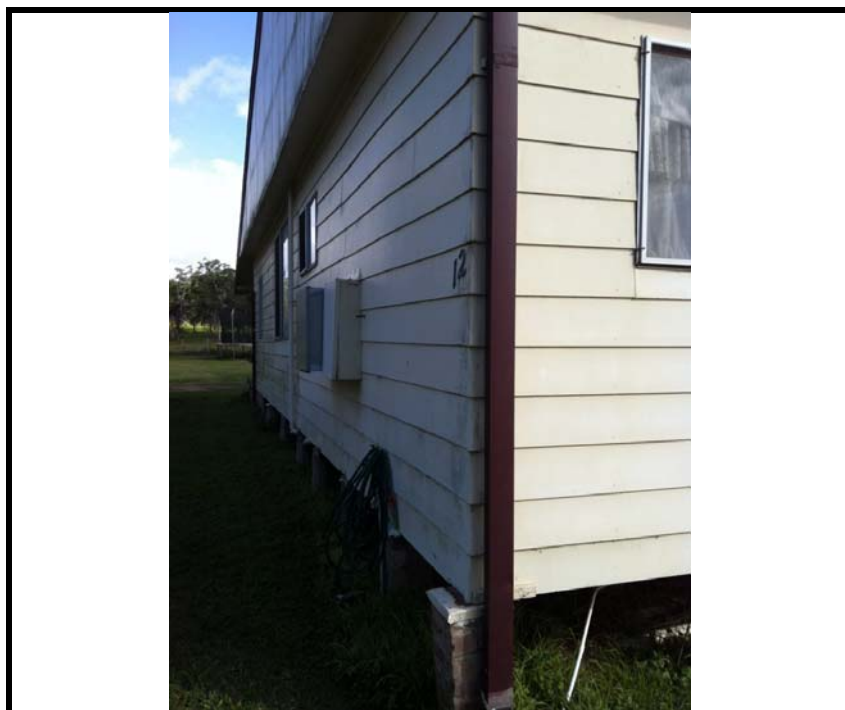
8 Bowditch Avenue - Section of the damaged AC sheeting lining the walls to the shed.
